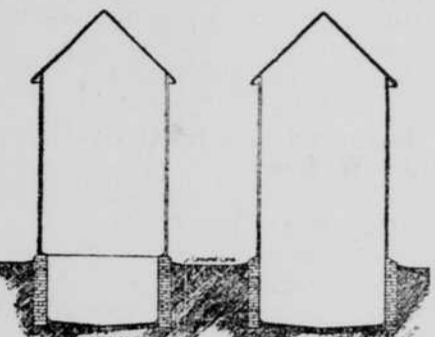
Correct and Incorrect Methods of Constructing Silo Foundations.
